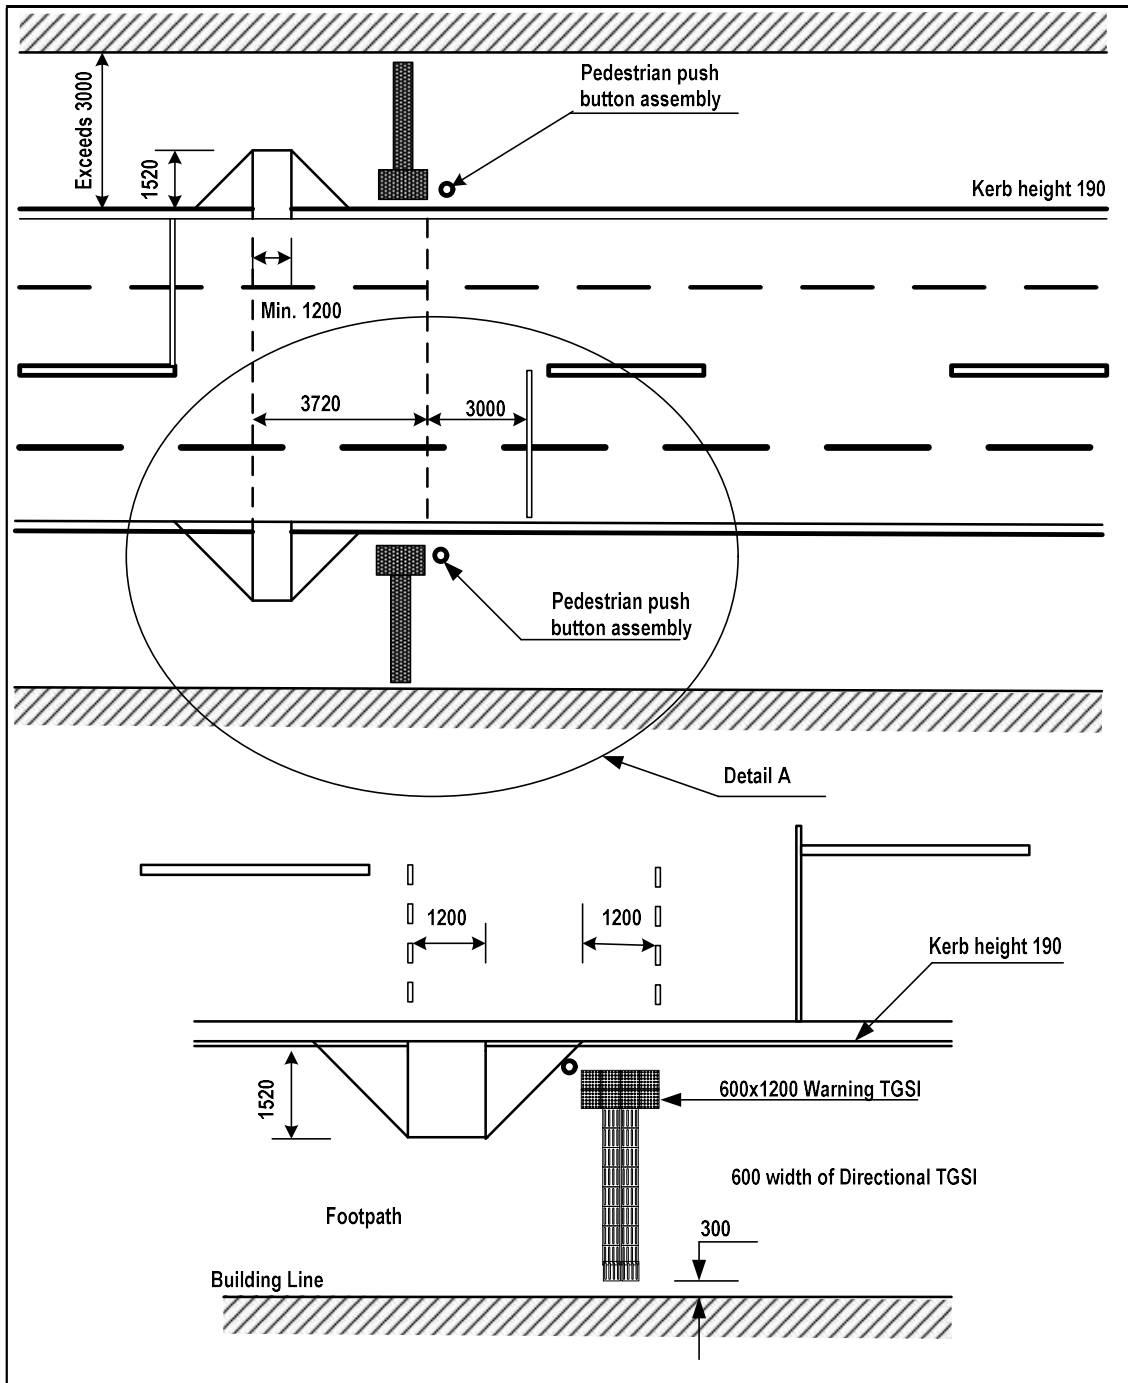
Mid-block crossing, dual separate entry crossing points, 190 kerb height, 1:8 kerb ramps, footpath greater than 3000
